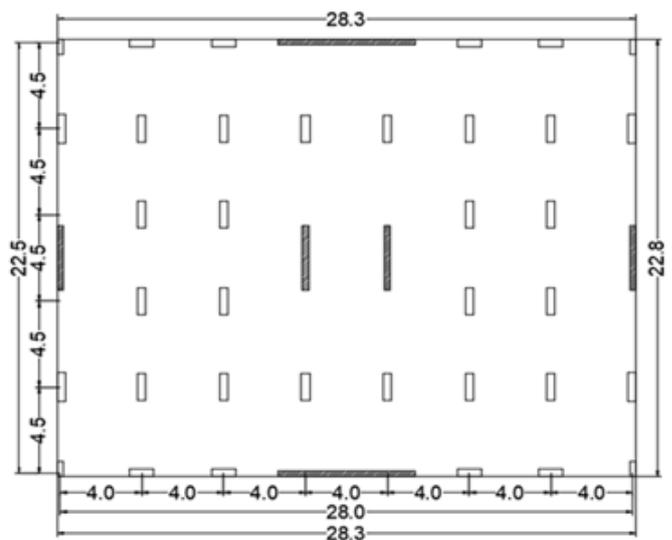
Model (7) Building with Shear Walls at the center as well as the center of the exterior perimeter
